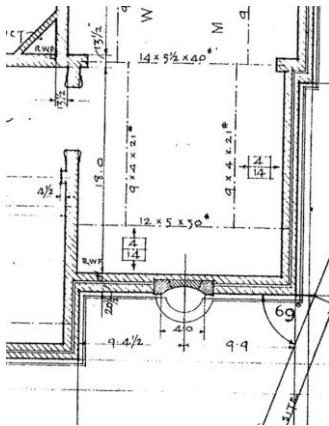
Change in cross section of brick wall (Holmes NZ LP)
